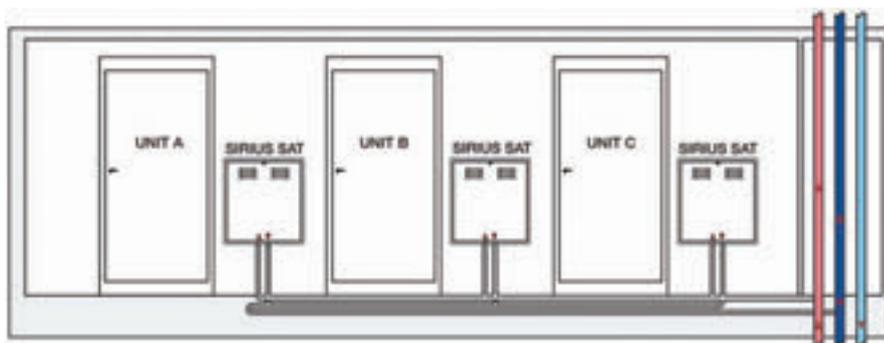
When deriving pipework distribution and pump sizes it is recommended that horizontal branches at each floor level are piped in a reverse return layout to assist with hydraulic balancing and to ensure even distribution of heat between dwellings
